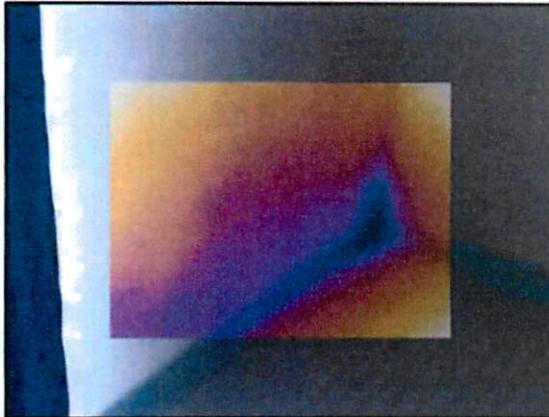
North wing, west restroom shower area, evidence of residual moisture in wall system as viewed by IR camera
